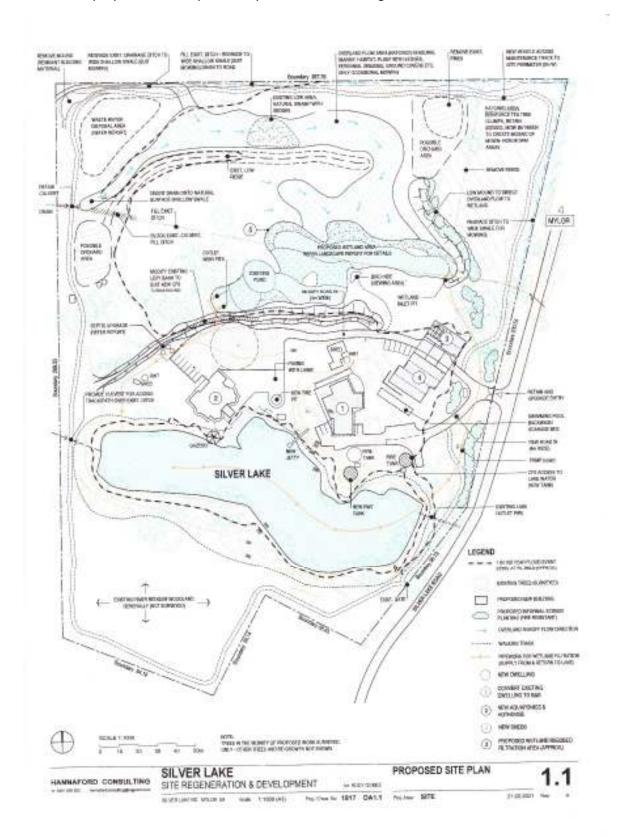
Proposed Landscape Development (Revised 19.02.2021)
